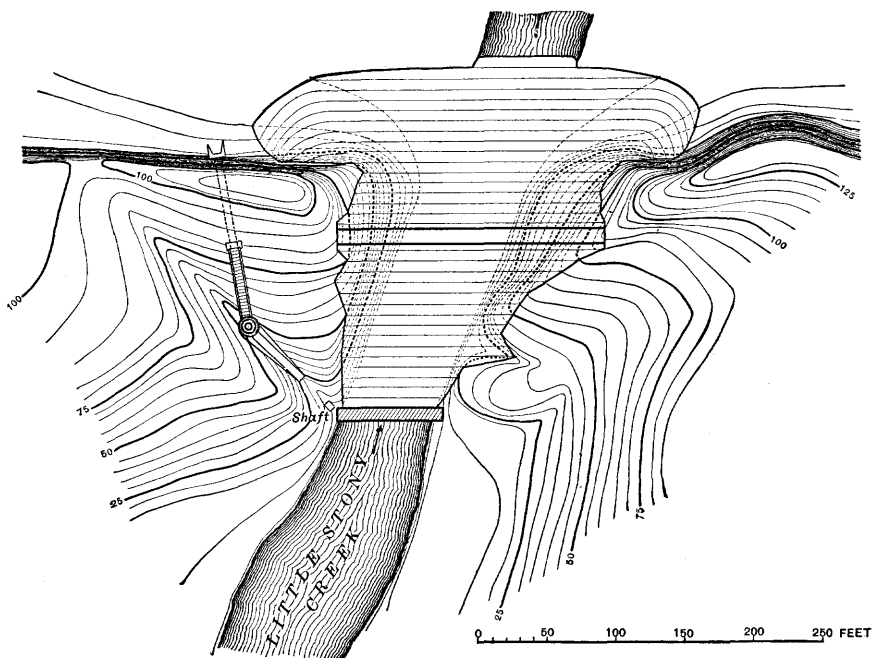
Plan of rock-filled dam, East Park dam site.
